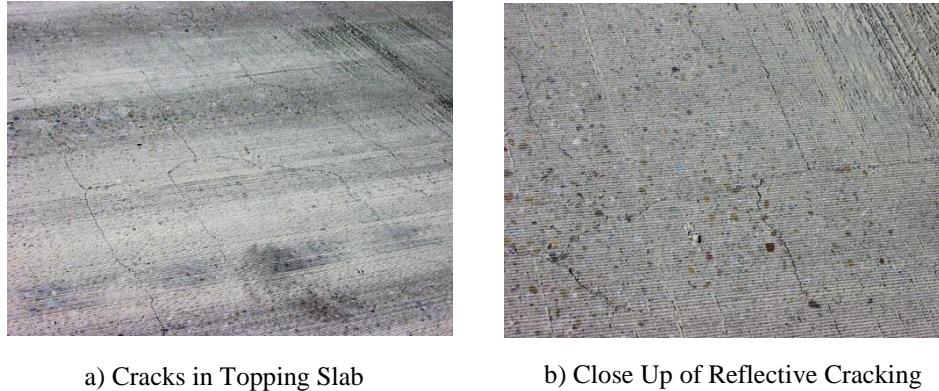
Reflective (Transverse) Crack Pattern in CIP Topping Slab Above Joint between Precast Deck Panels on SMHB [11]
